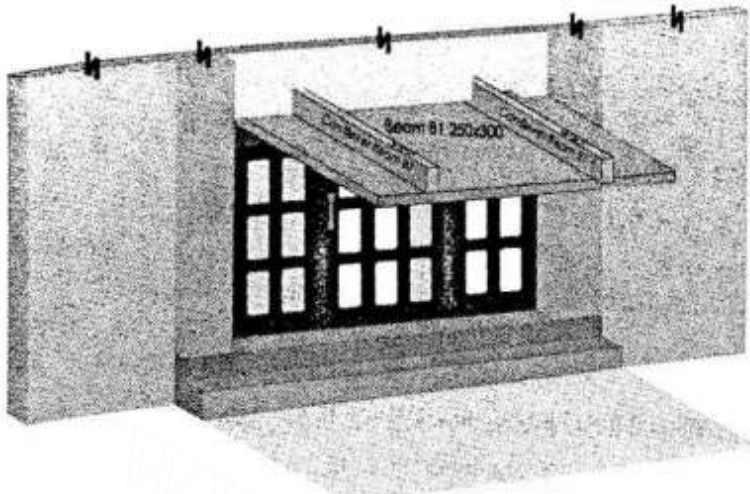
Over Hanging Porch Slab Supported on Beams
